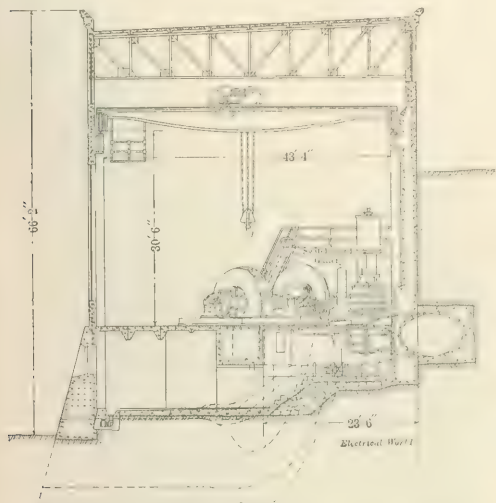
SECTIONAL VIEW THROUGH POWER HOUSE
